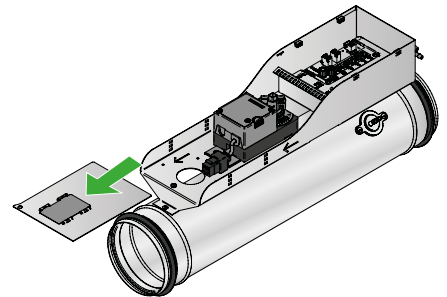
Dismantle the cover on the motor shelf by pulling it out of the slot in the motor shelf.
